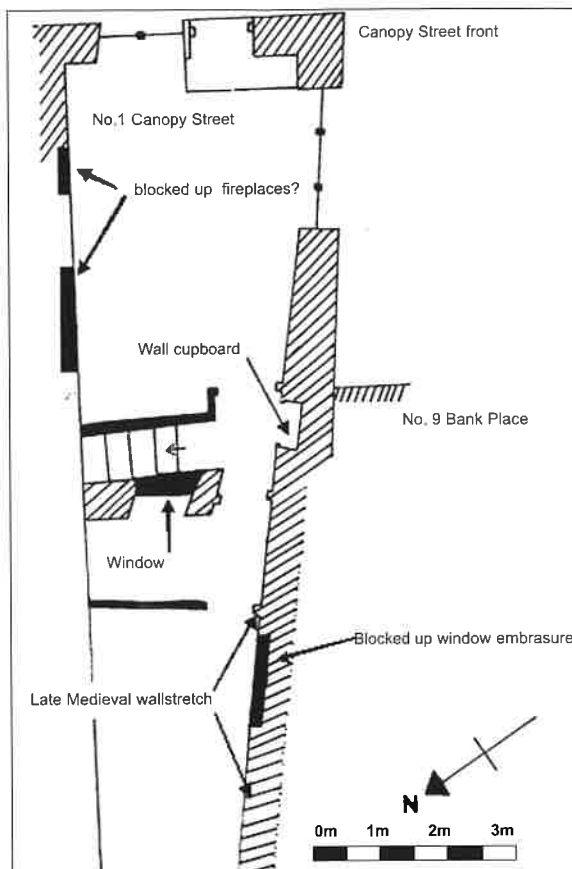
Ground floor survey of the building at No. 1 Canopy Street. Original scale 1:50 (J. Farrelly 2008)
